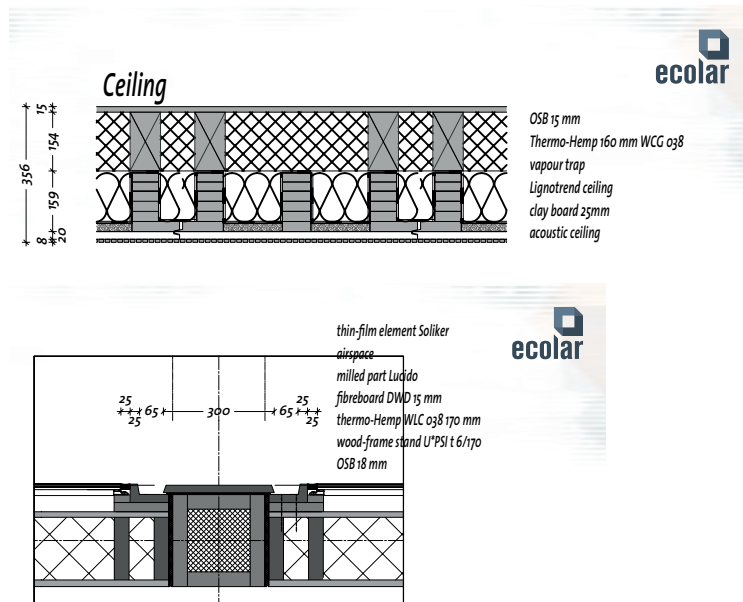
Ecolar house construction details¹¹⁸ (ceiling detail – up and Lucido wall system – down).
